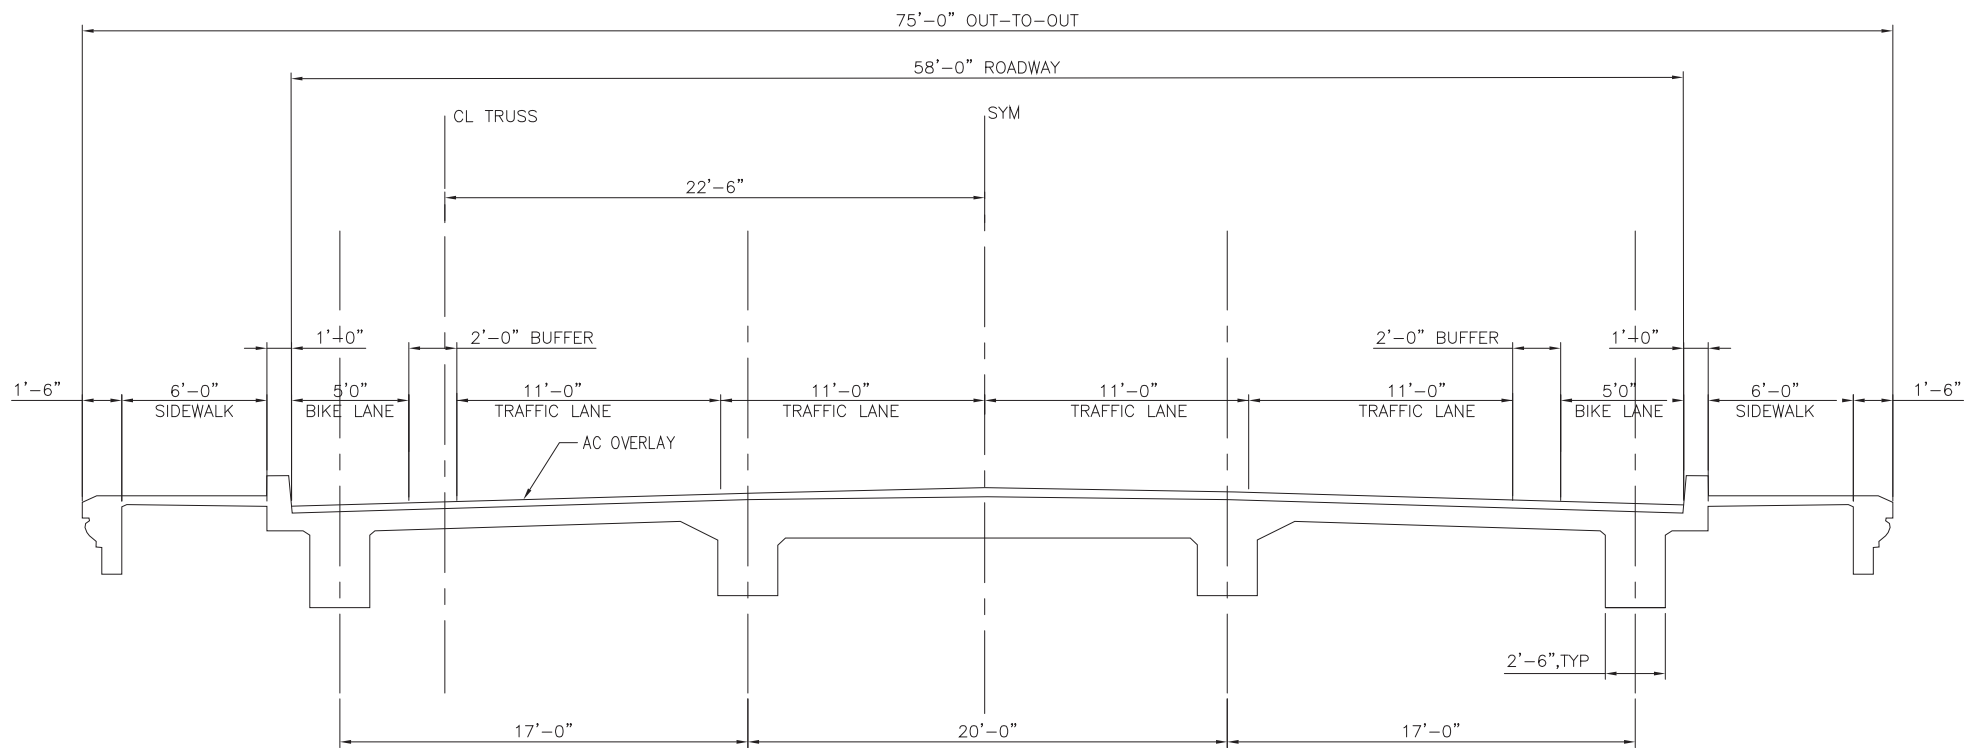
TYPICAL EXISTING DECK SECTION
